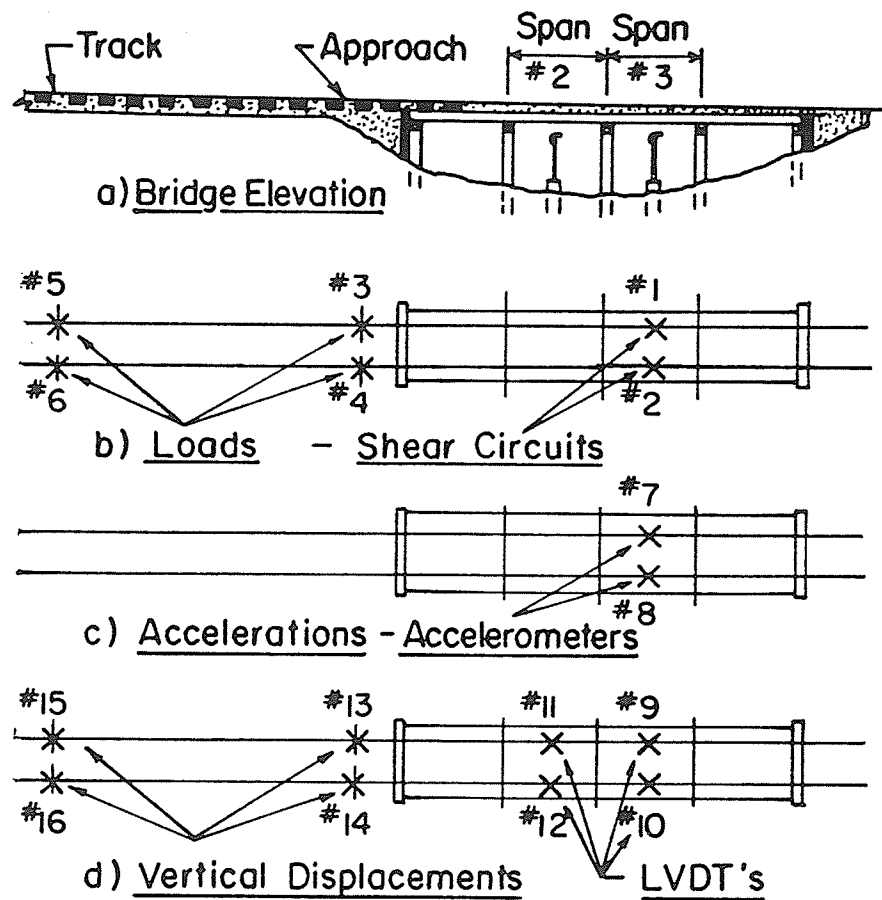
Location of shear circuits, LVDT's and accelerometers - ballast deck bridge site
